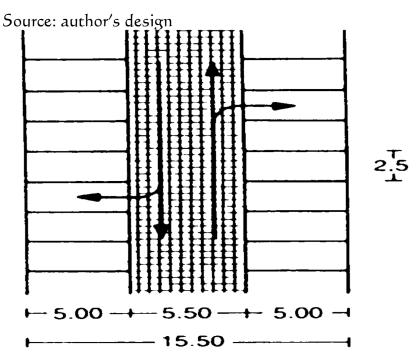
90⁰ Exit/Entry, Two – Way Traffic Parking Space 2.5 m Wide - The Adopted Format.
